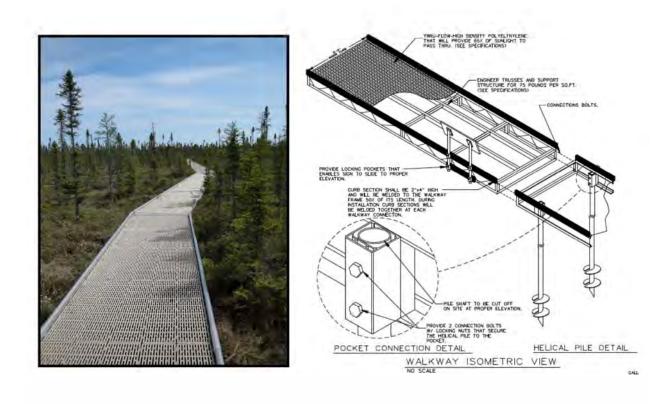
Minnesota Big Bog Boardwalk and construction detail.
